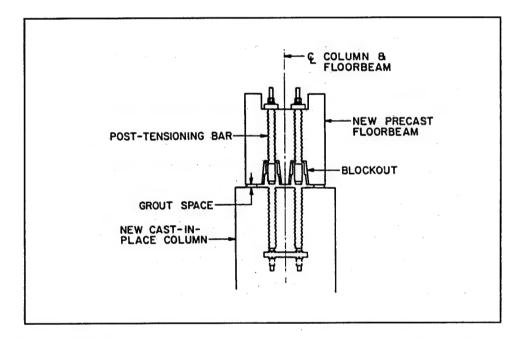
Cross section showing the floor-beam column bent for the Fremont Street Bridge (from Smyers 1984)
